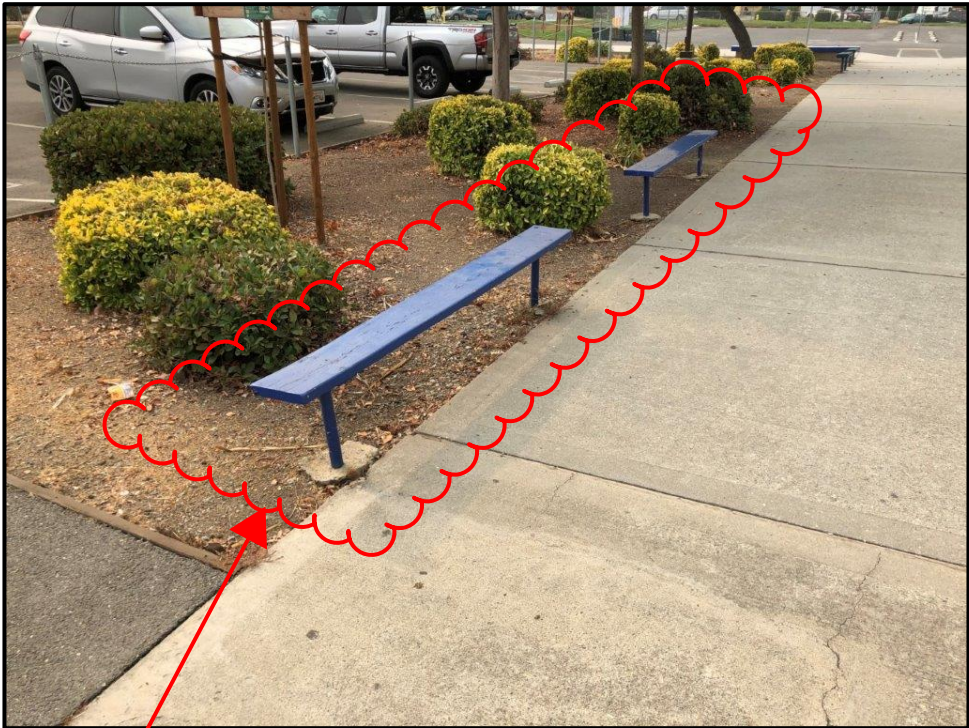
Quantity two (2) existing benches to be removed. Remove concrete footings and backfill.
